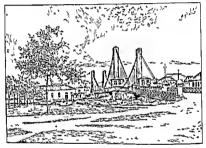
THE COLCANTE SUSPENSION BRIDGE, MANILA
